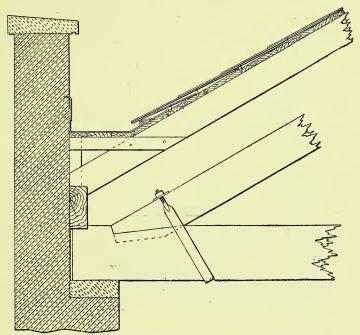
Cross Section through Lead Gutter behind Brick Parapet.
